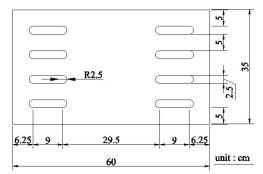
UHPC precast concrete specimen with 8 opening holes
